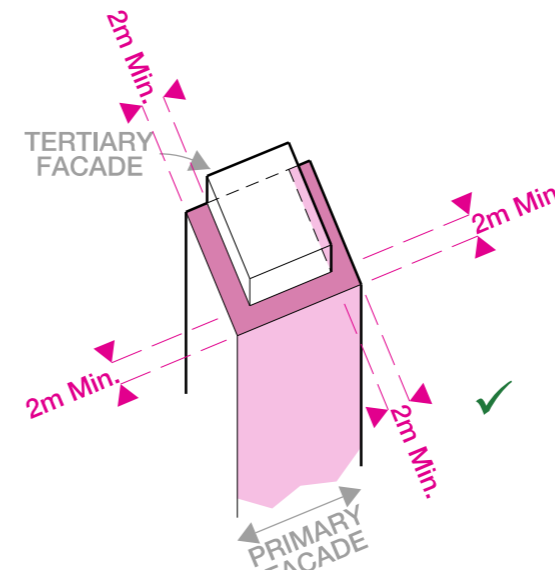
Configuration of setback floor - 3 sided set-back top floor.
